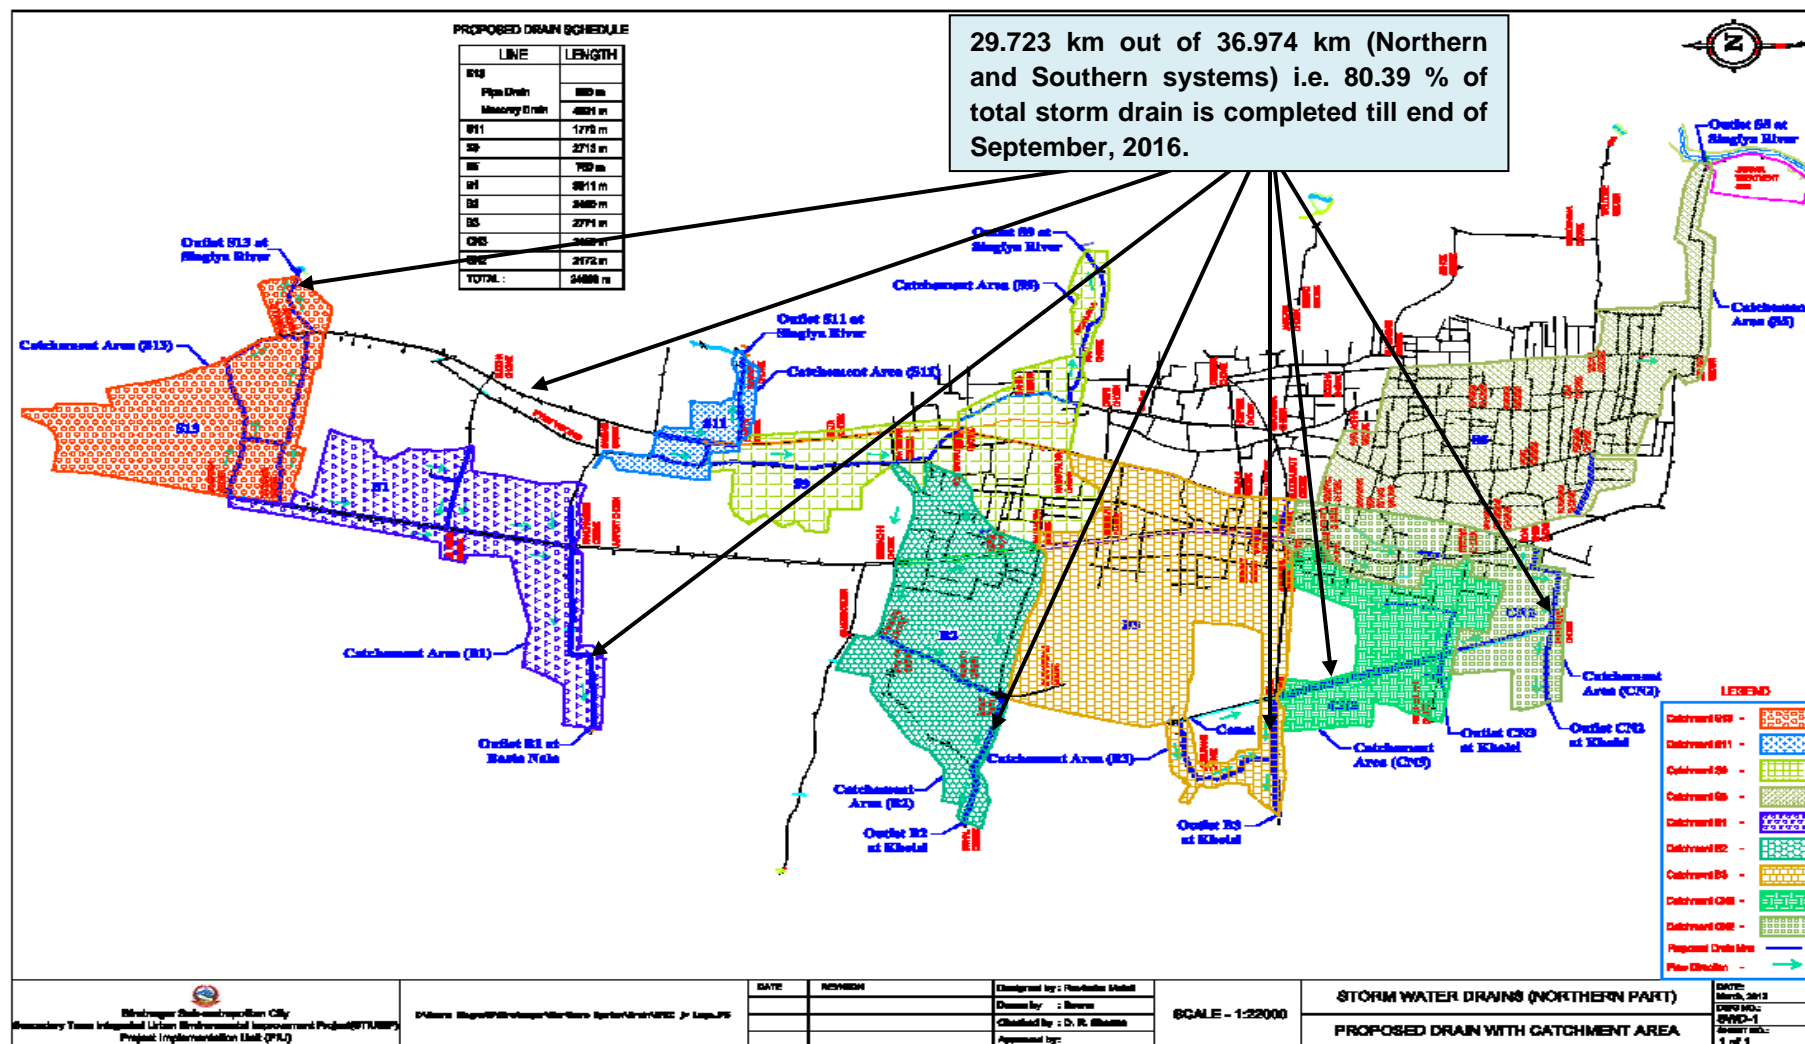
Proposed Storm Water Drains in BSMC (Northern Drainage System)
